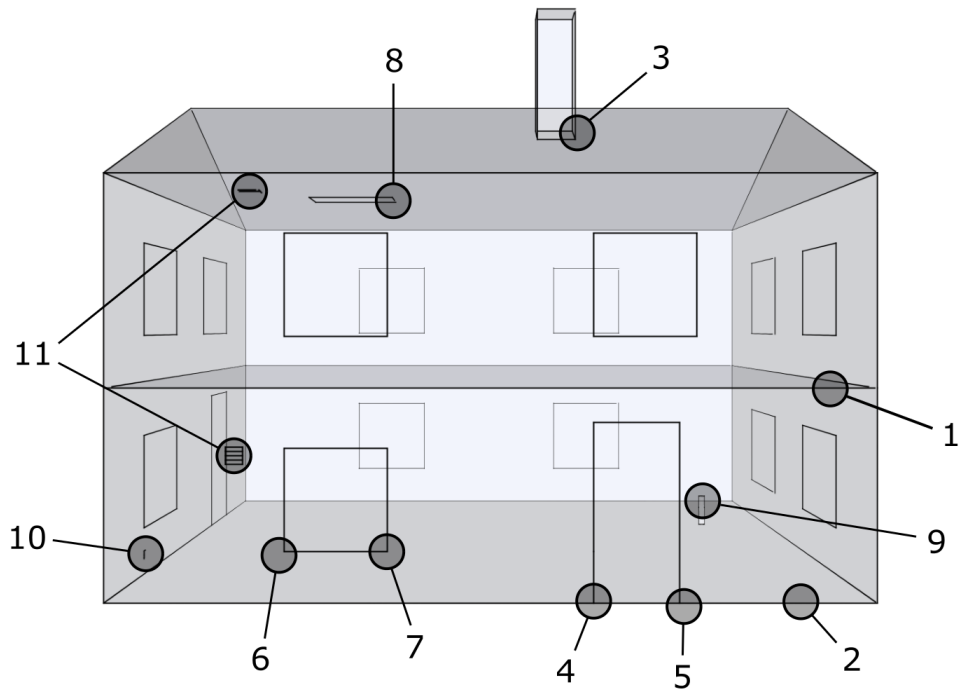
Principal drawing showing leakages taken into account in the model: 1. Ceiling-Wall Joint, 2. Floor-Wall Joint, 3. Chimney, 4. Door, 5. Door frame, 6. Window frame, 7. Window, 8. Attic Hatch, 9. Piping and wiring penetrations, 10. Electric outlet, 11. Ventilation inlet and outlet
